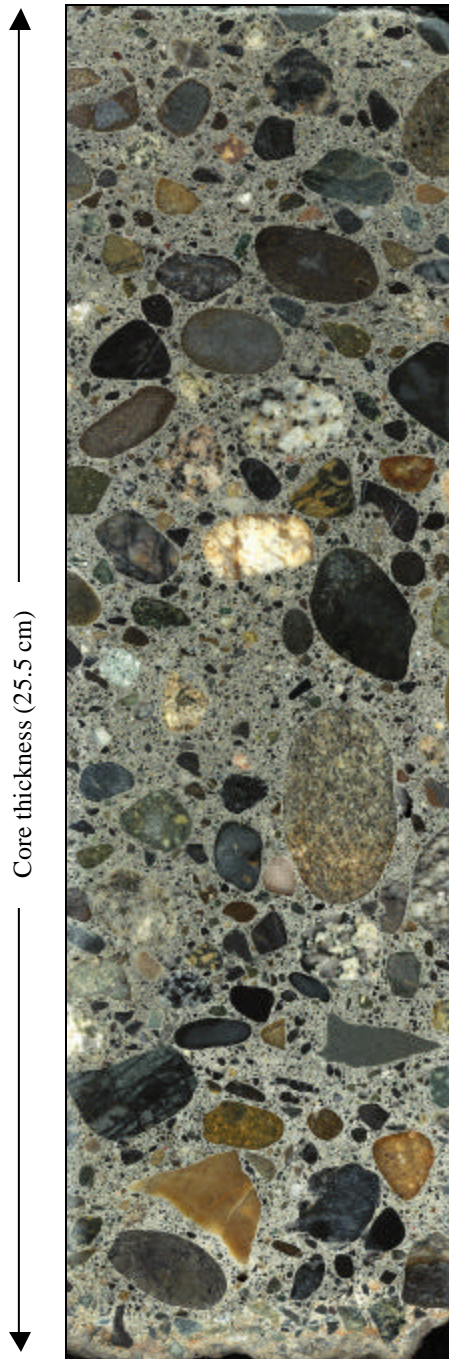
Polished cross-section of pavement section 53-3011.
